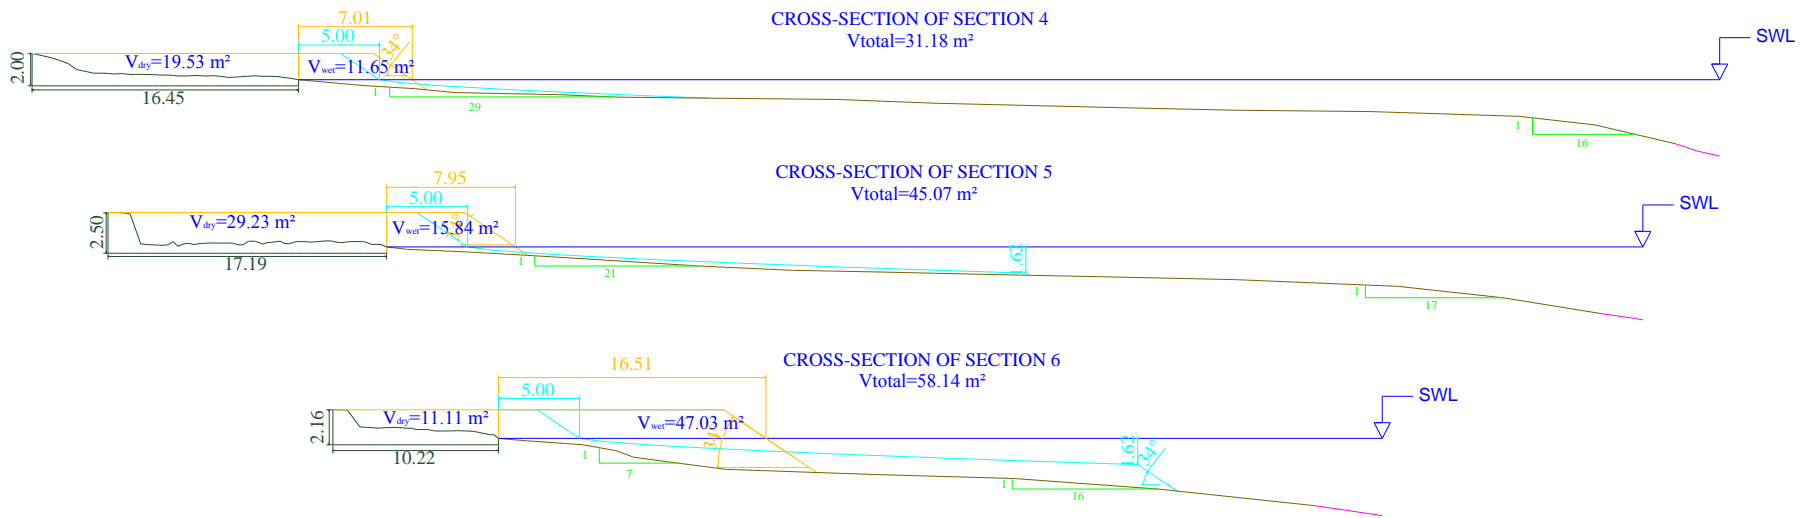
Design profiles of Section 4,5 and 6 for 5 m new dry beach width ($D_{fill}=0.45$ mm).
